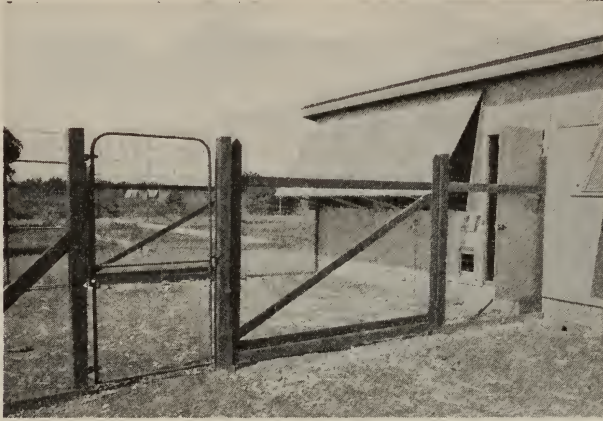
A close view of an 8-foot removable fence panel showing construction in detail.
